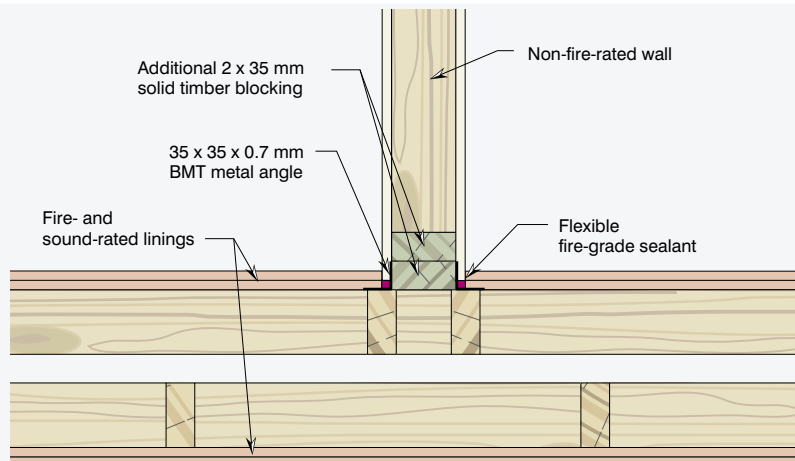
Timber sacrificial blocks used to close a gap for a 90 minutes system – plan view.
